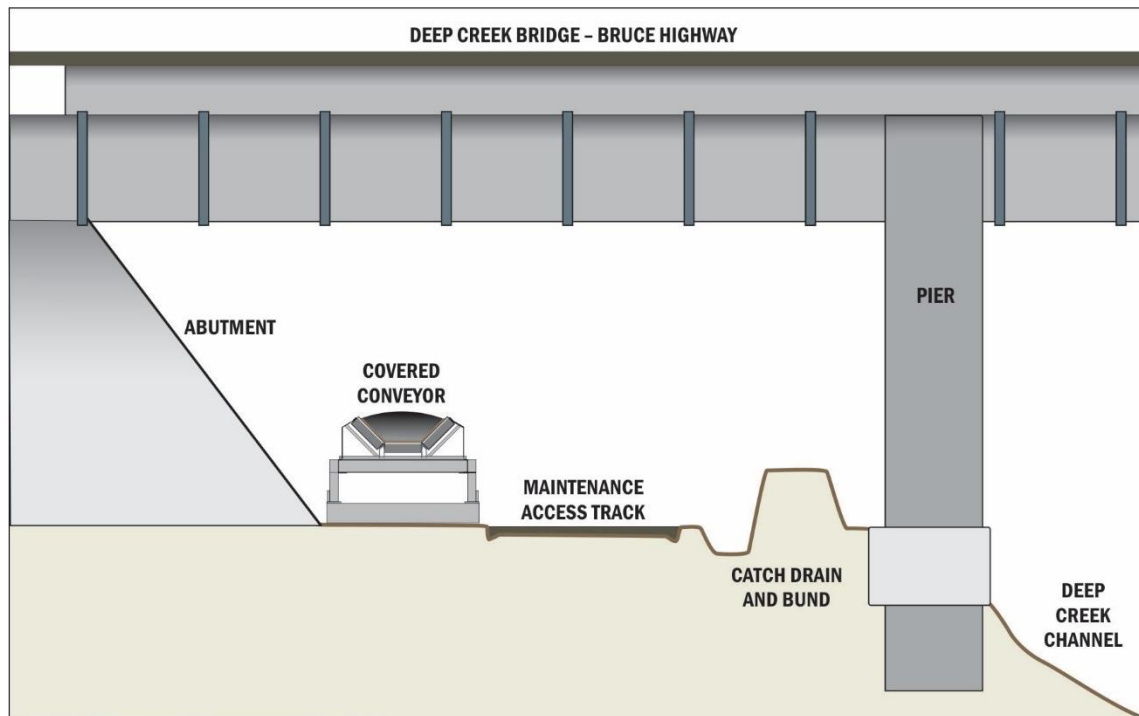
Conveyor crossing under Deep Creek road bridge
